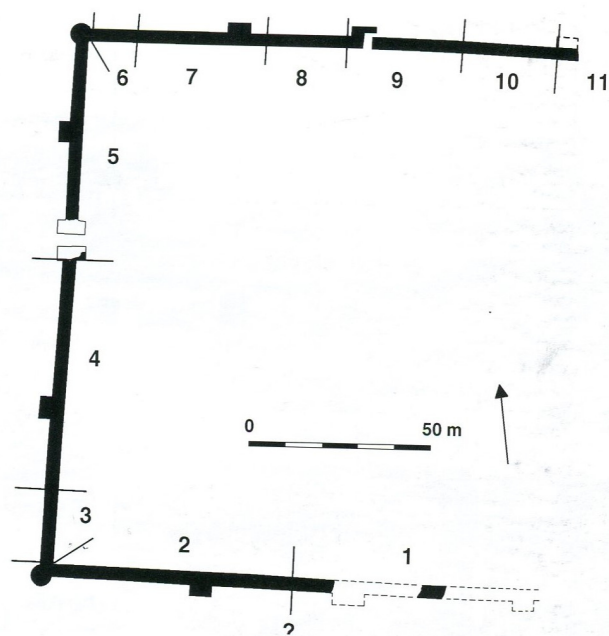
Sections of wall at Richborough which were built by different gangs.
